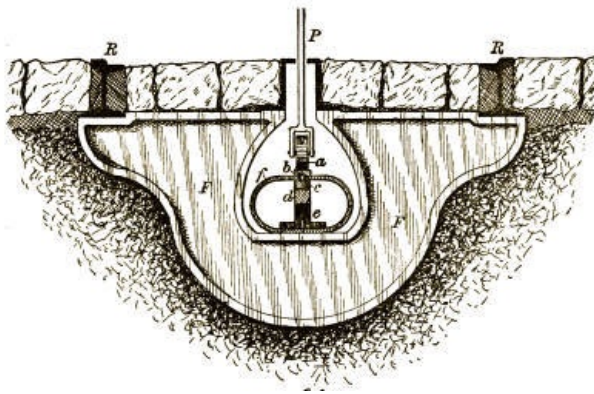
UNDERGROUND CONDUIT WITH INCLOSED CONDUCTOR.
